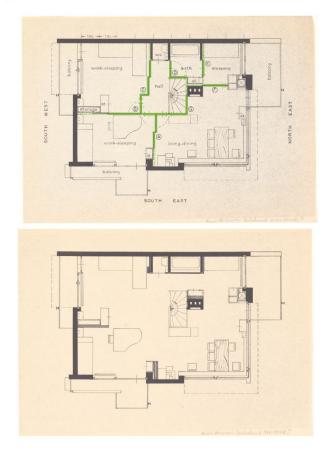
Two plans of first floor Rietveld Schröder House, in closed (top) and open (bottom) configuration. Arrows and labels added by author. Rietveld Schröderarchief/Centraal Museum Utrecht.
